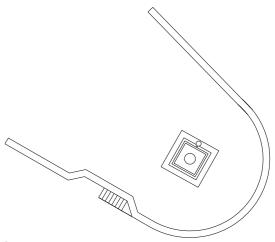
Plan of the Pier Head / Alexandra Lighthouse
